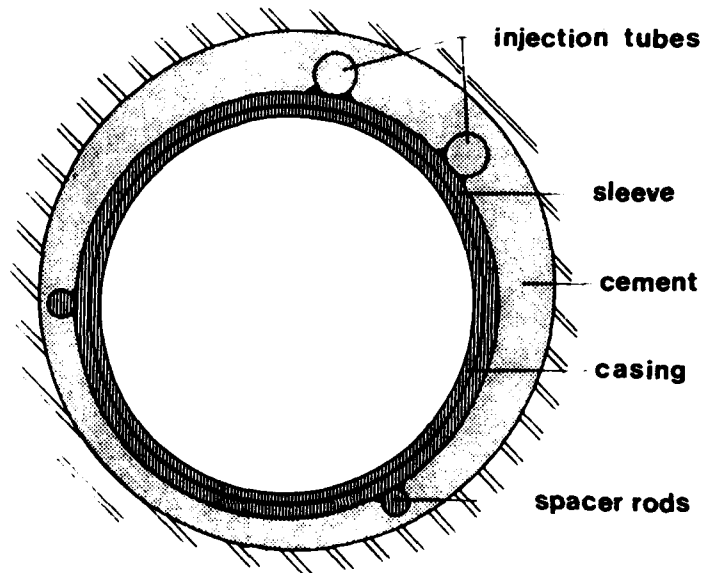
Cross section of borehole with casing, sleeve, injection tubes (for pumping of cement), spacer rods and cement between the casing and the rock.
